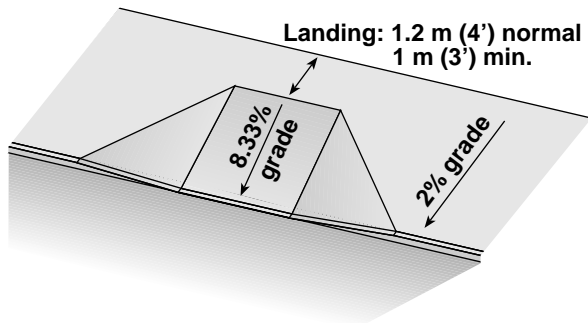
1 m (3 ft) wide area at 2% cross-slope on sidewalks
